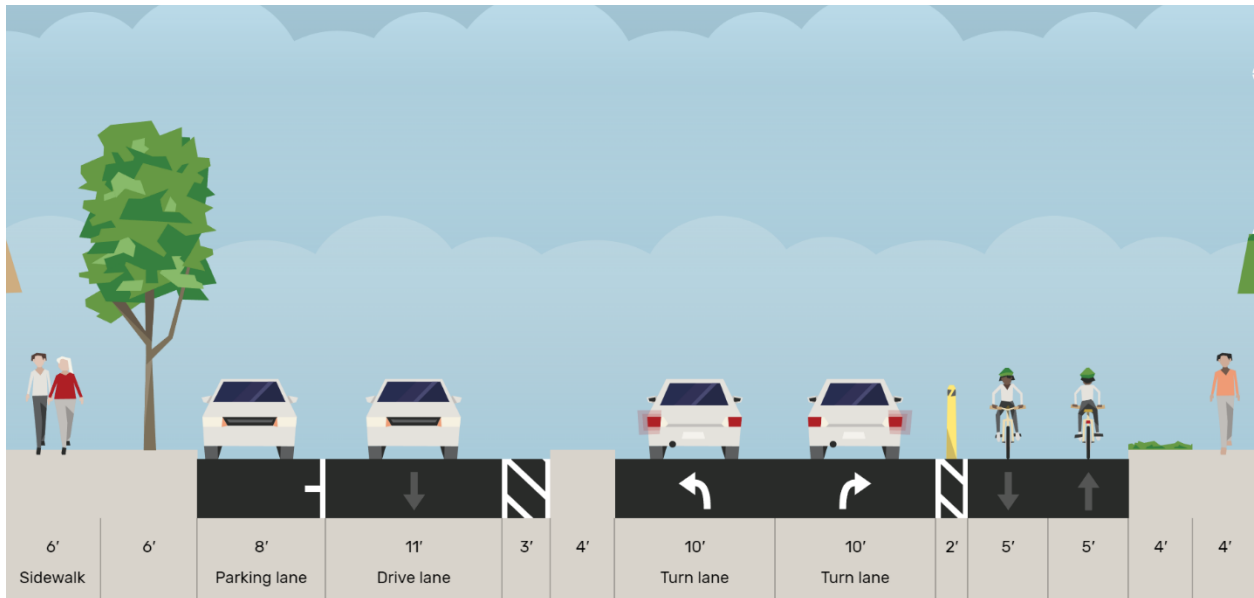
HOLLAND LANE CORRIDOR ALTERNATIVE 2 CROSS-SECTION FROM JAMIESON AVENUE TO DUKE STREET
